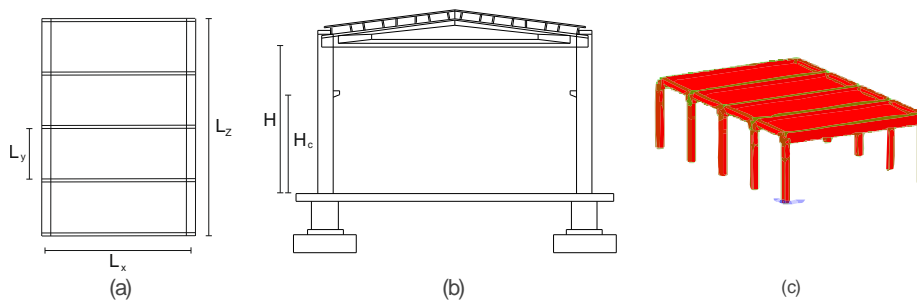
Prototype PRC buildings; (a) numerical model (b) plan; (c) elevation.
